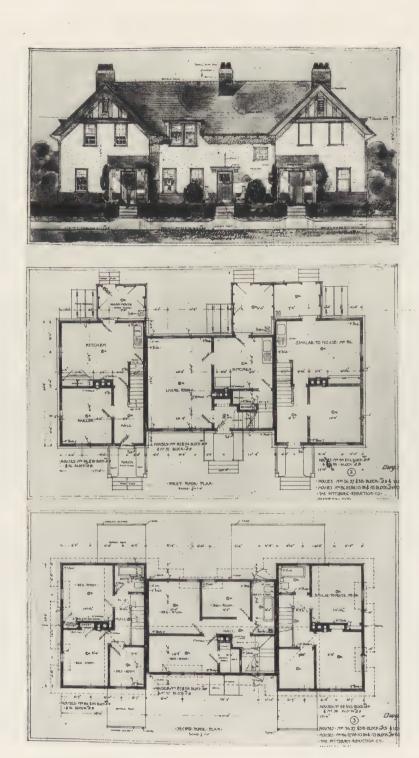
ELEVATION AND PLANS OF THREE-FAMILY HOUSE—ALUMINUM CO. OF AMERICA, MASSENA, N. Y. ALBERT H. SPAHR, ARCHITECT.
